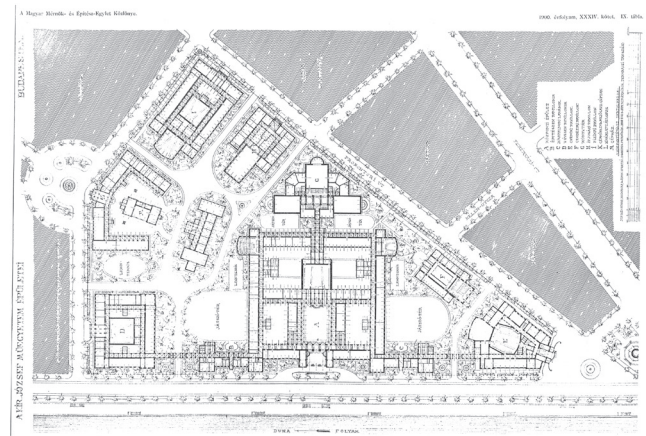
Győző Czigler's site plan concept on the campus of the Technical University, 1900. (After Czigler [4, t. IX.], [17, pp. 34-35]) A. Central Building. B. Pavilion of Architects. C. Administrators' residences. D. First year students' pavilion. E. Chemistry Pavilion. F. Geodesics Pavilion. G. Library. H. Youth Pavilion. I. Physics Pavilion. K. Machine shop and agricultural machinery studies building. L. Experimental building. M. Engine-house.
